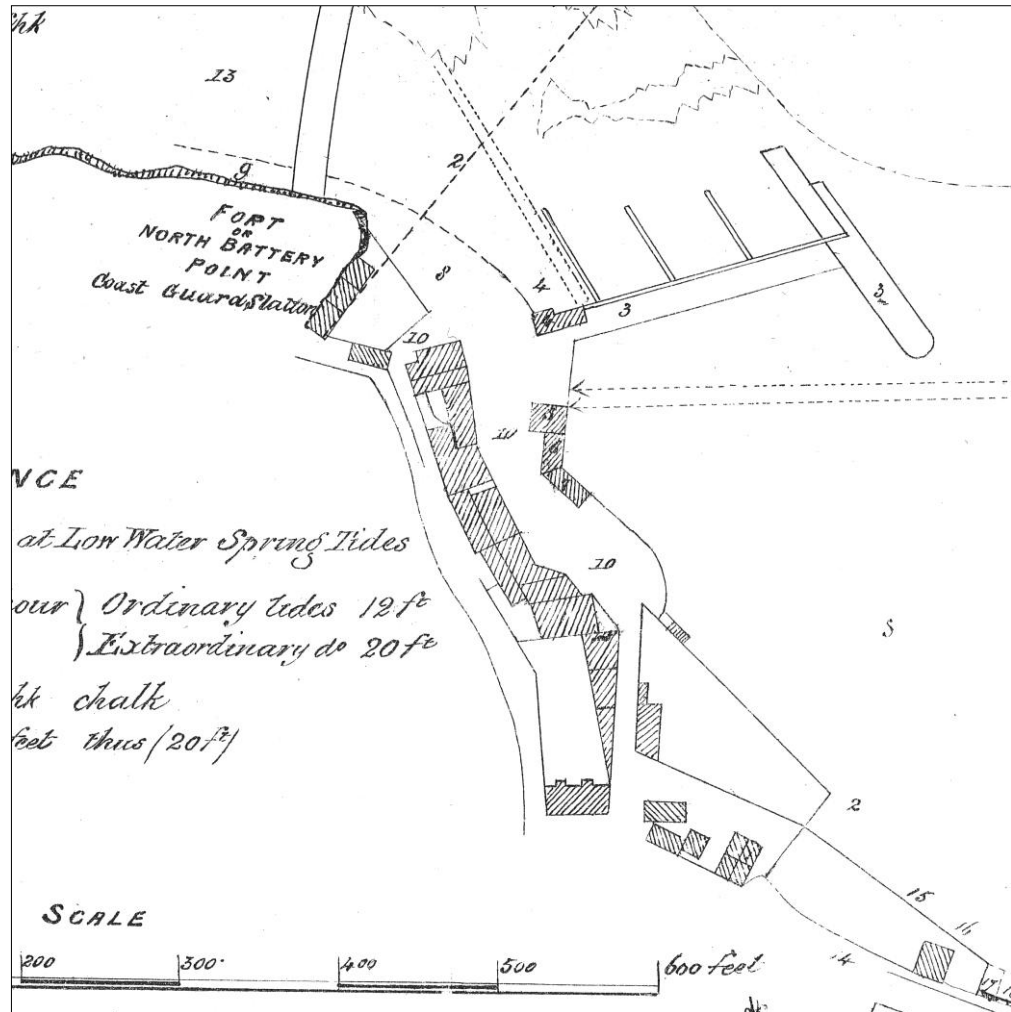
, Plan of Broadstairs pier in 1856. 4= Pier House (Boathouse), 5 = Droit House (CKS Q RUM 389B)
